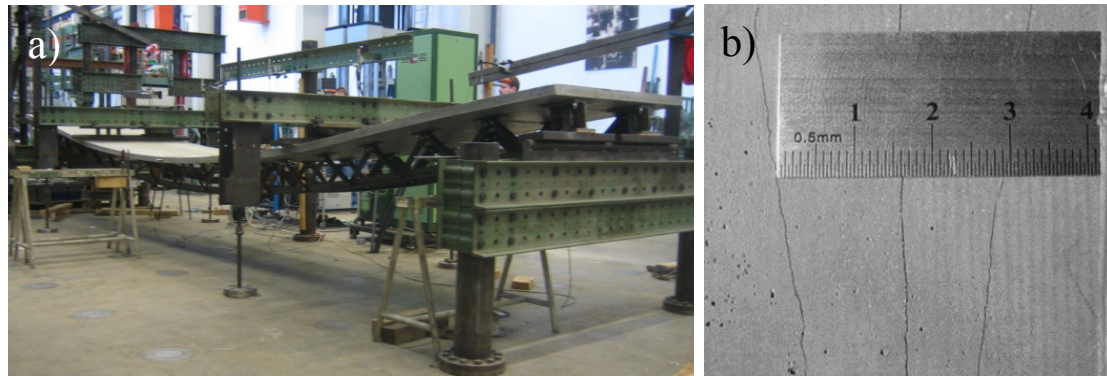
a) Deformed shape of specimen MP2 during ULS loading, and b) example of multiple flexural cracks on bottom of ECC slab at mid-span.
